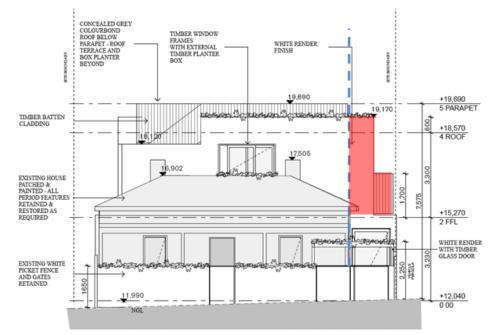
(taken from the Heritage Advice provided): It is noted that the diagram presents the previous design, prior to the lodgement of the section 57A plans (decision plans); however, the recommended setback from the northern boundary can still be applied to the new design.
